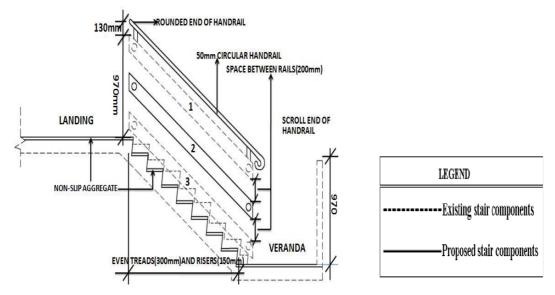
Typical section B-B through stairs showing existing and proposed components
